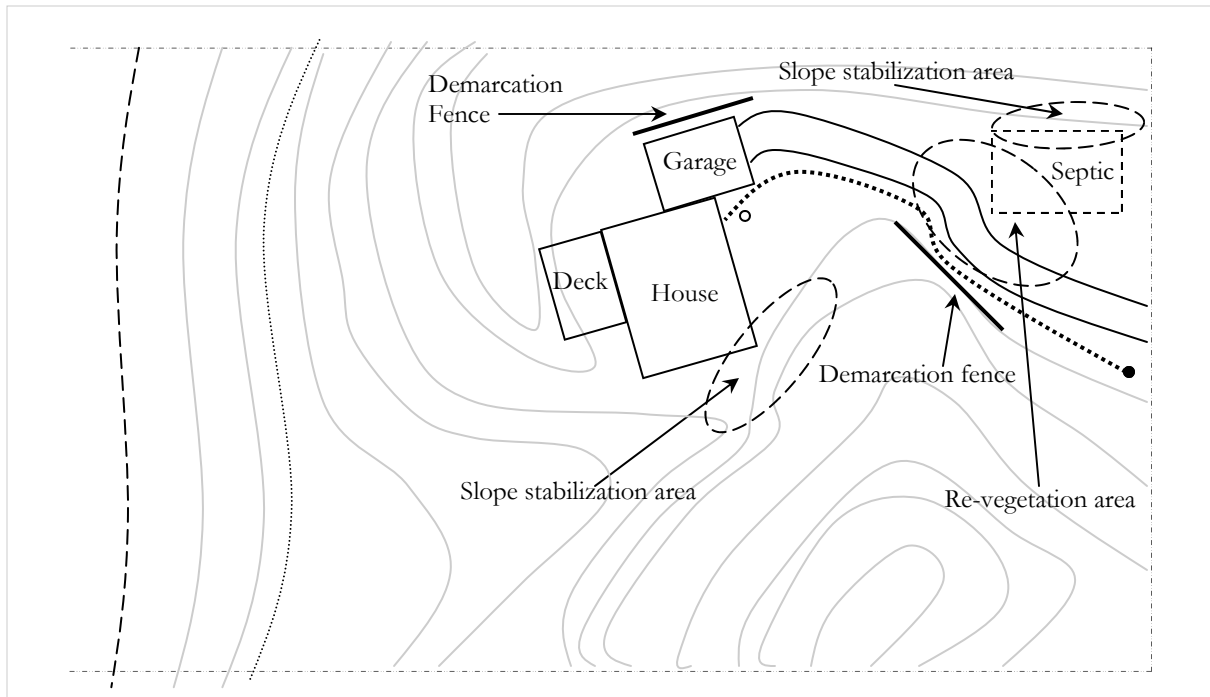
Appropriately sited structures with identified areas for slope stabilization and plant re-establishment areas (septic location used as staging area for construction).
